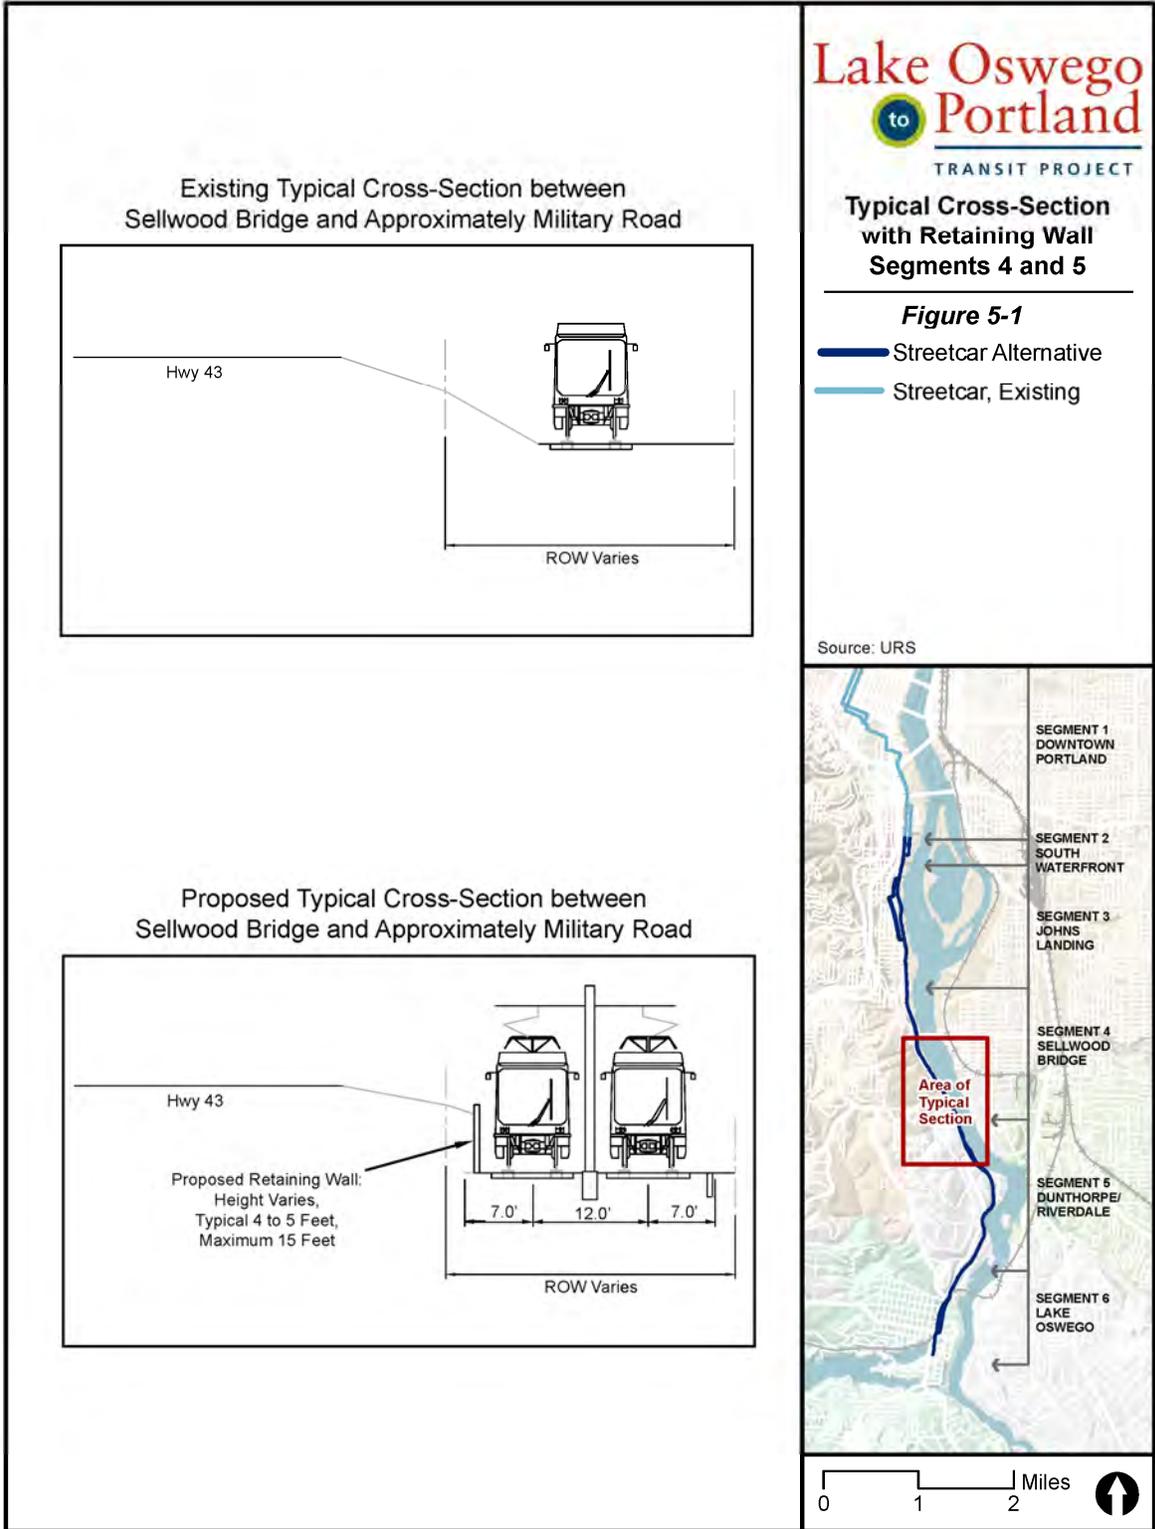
TYPICAL CROSS-SECTION WITH RETAINING WALL SEGMENTS 4 AND 5
